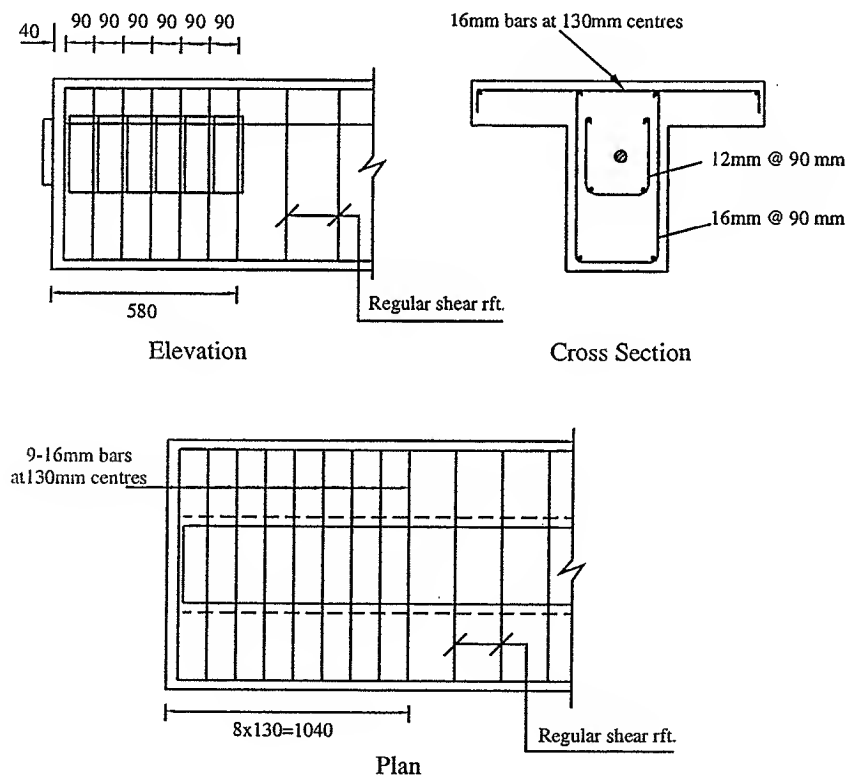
Reinforcement details for the anchorage zone
